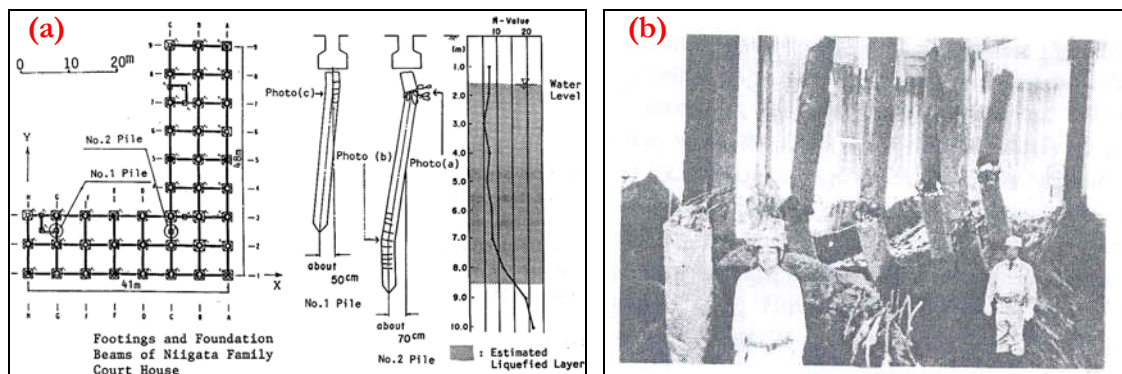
(a): Pile failure of Niigata Family Court House building during 1964 Niigata earthquake, Hamada (1992a); (b): Pile failure observed during the excavation of the NHK building after 1964 Niigata earthquake, Hamada (1992a).
